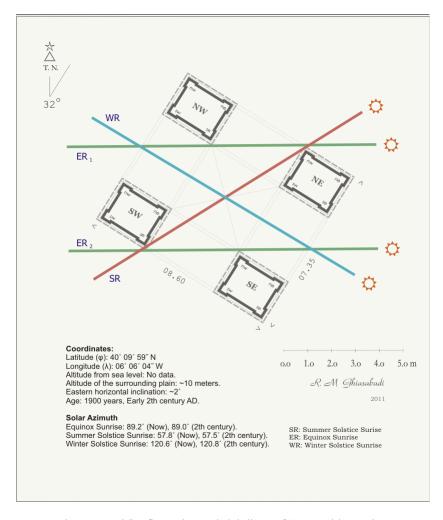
The floor plan and sightlines of Caparra Tetrapylon
